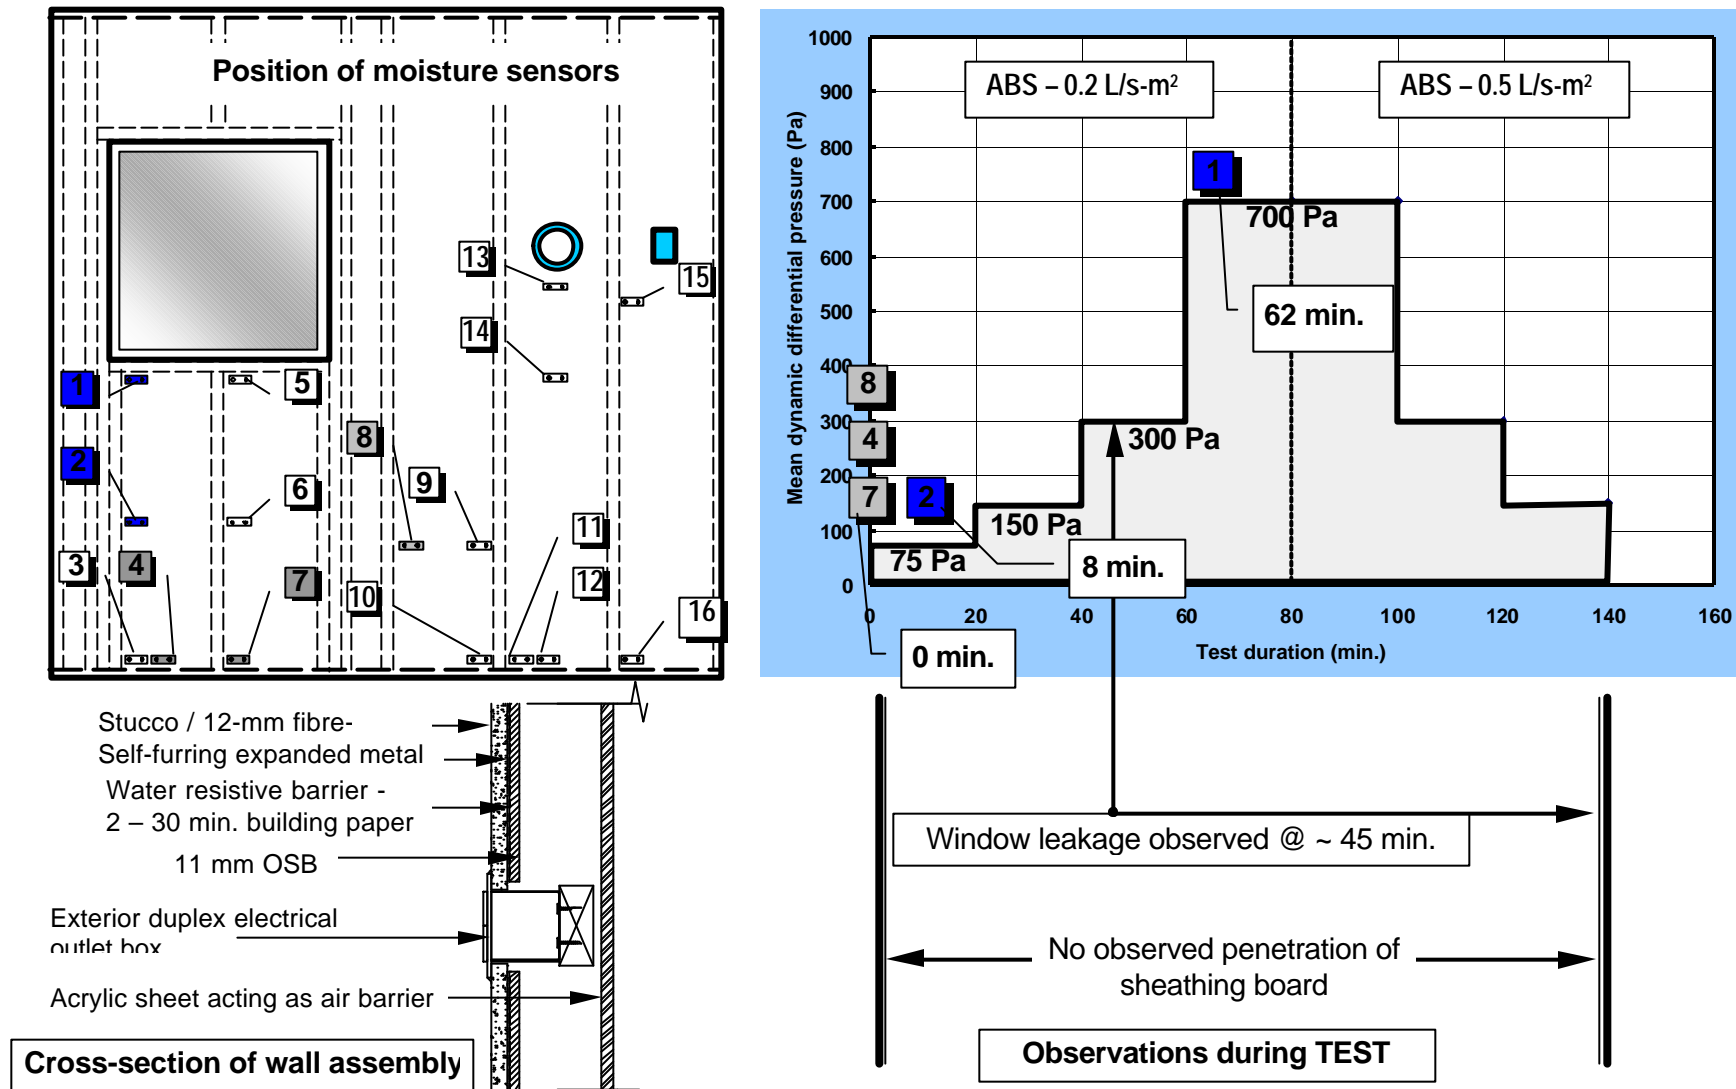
Stage 2 Water Penetration of WA-4 Static test on Stucco-clad walls
